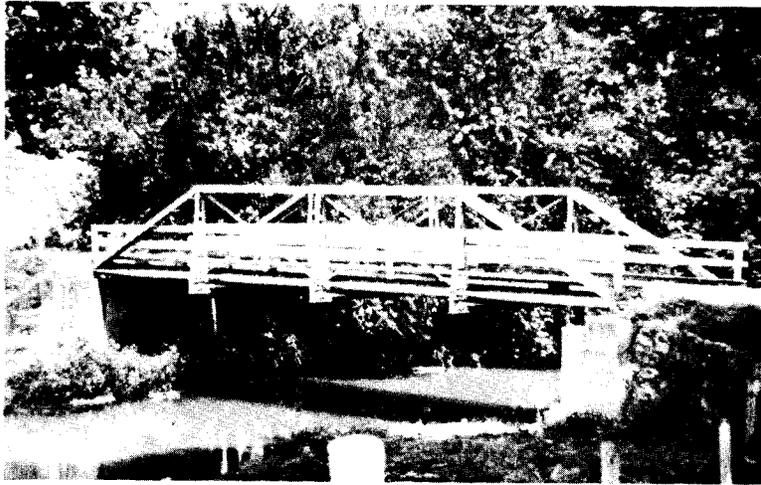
A typical pin connected Low/Pony truss used for a 58-foot span bridge. (Rockingham County; see form/photo number 08-82-7.)
